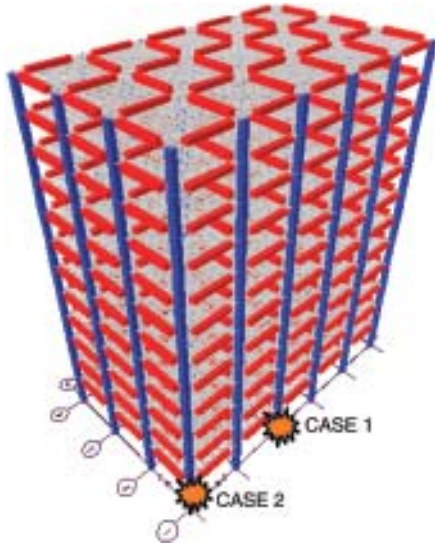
ETABS model of 12-story reinforced concrete framed building
